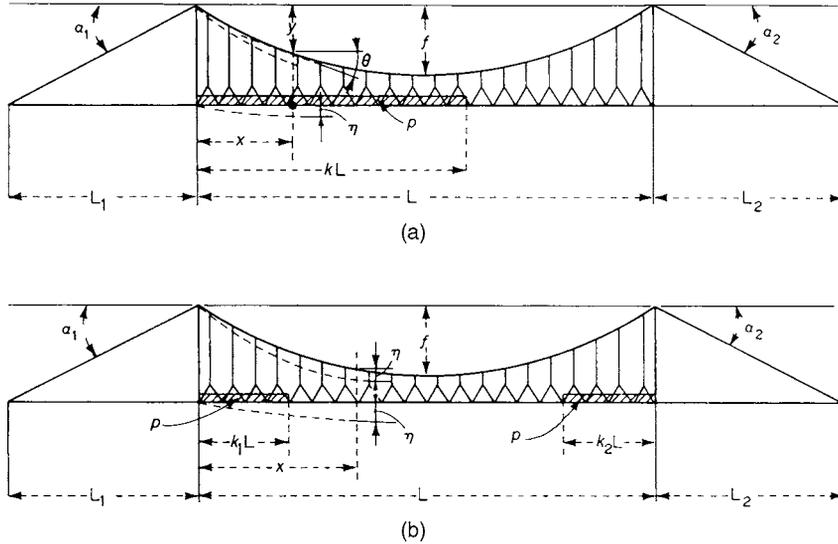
Suspension bridge with unloaded side spans and pin-ended main-span truss. (a) Single uniform load extending from a pylon into the main span. (b) Uniform load extending from both pylons into the main span.
